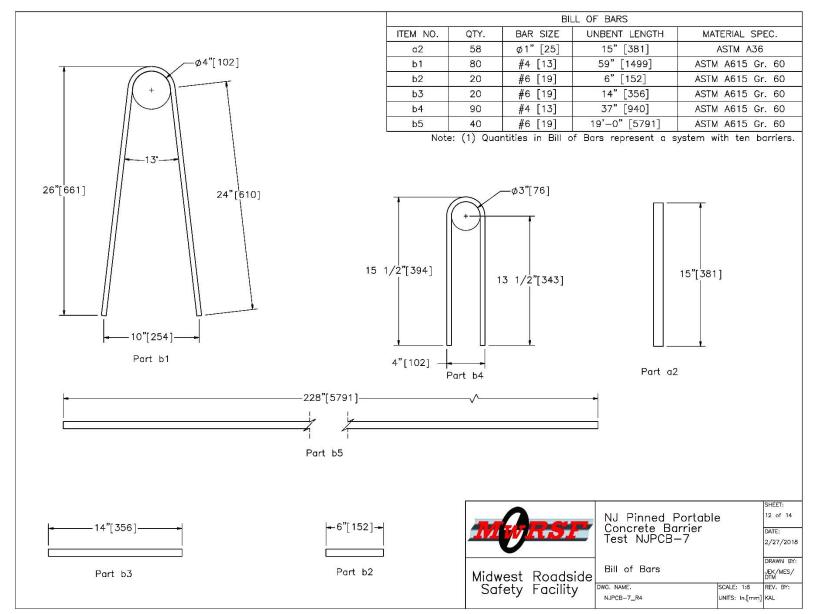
PCB Reinforcement Details, Test No. NJPCB-7
